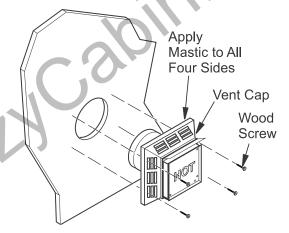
Installing Horizontal Vent Cap (Noncombustible Exterior)
